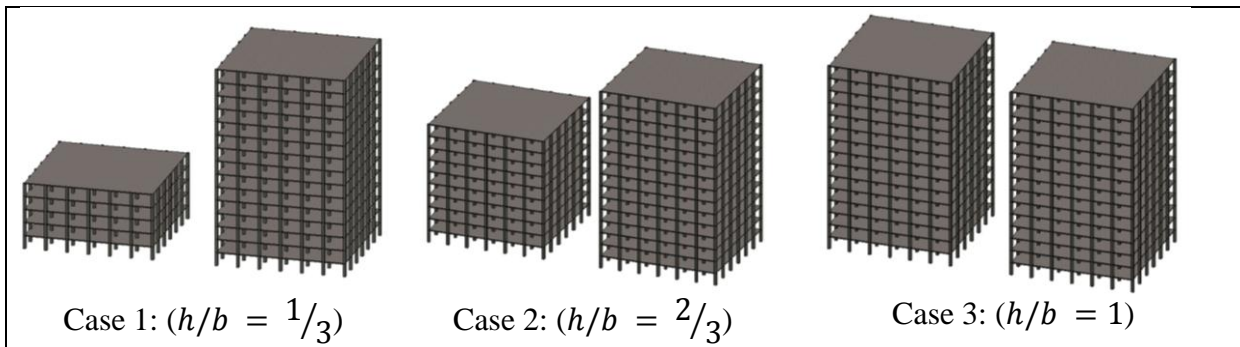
Case Study Forms, where h : the elevation of the adjacent building; b : the width of main building.
